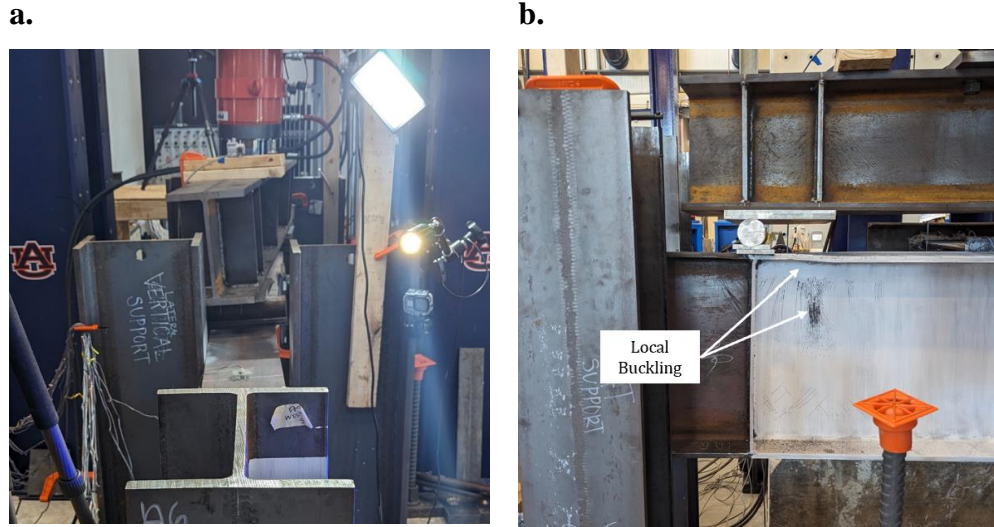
Test 1 Deformed Girder (a) Spreader Beam Instability due to LTB of Girder and (b) Local Buckling of Flange and Web Near Loading Points
